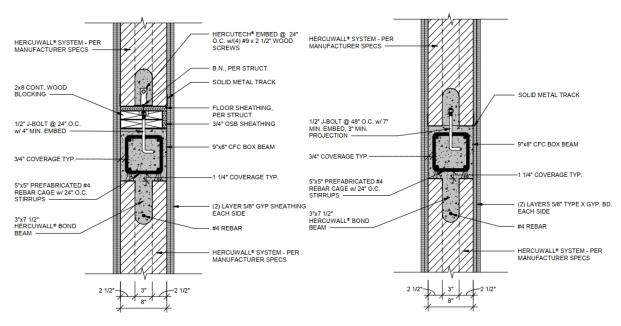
2-hr Load-Bearing Unbraced CFC Box Beam Wall
